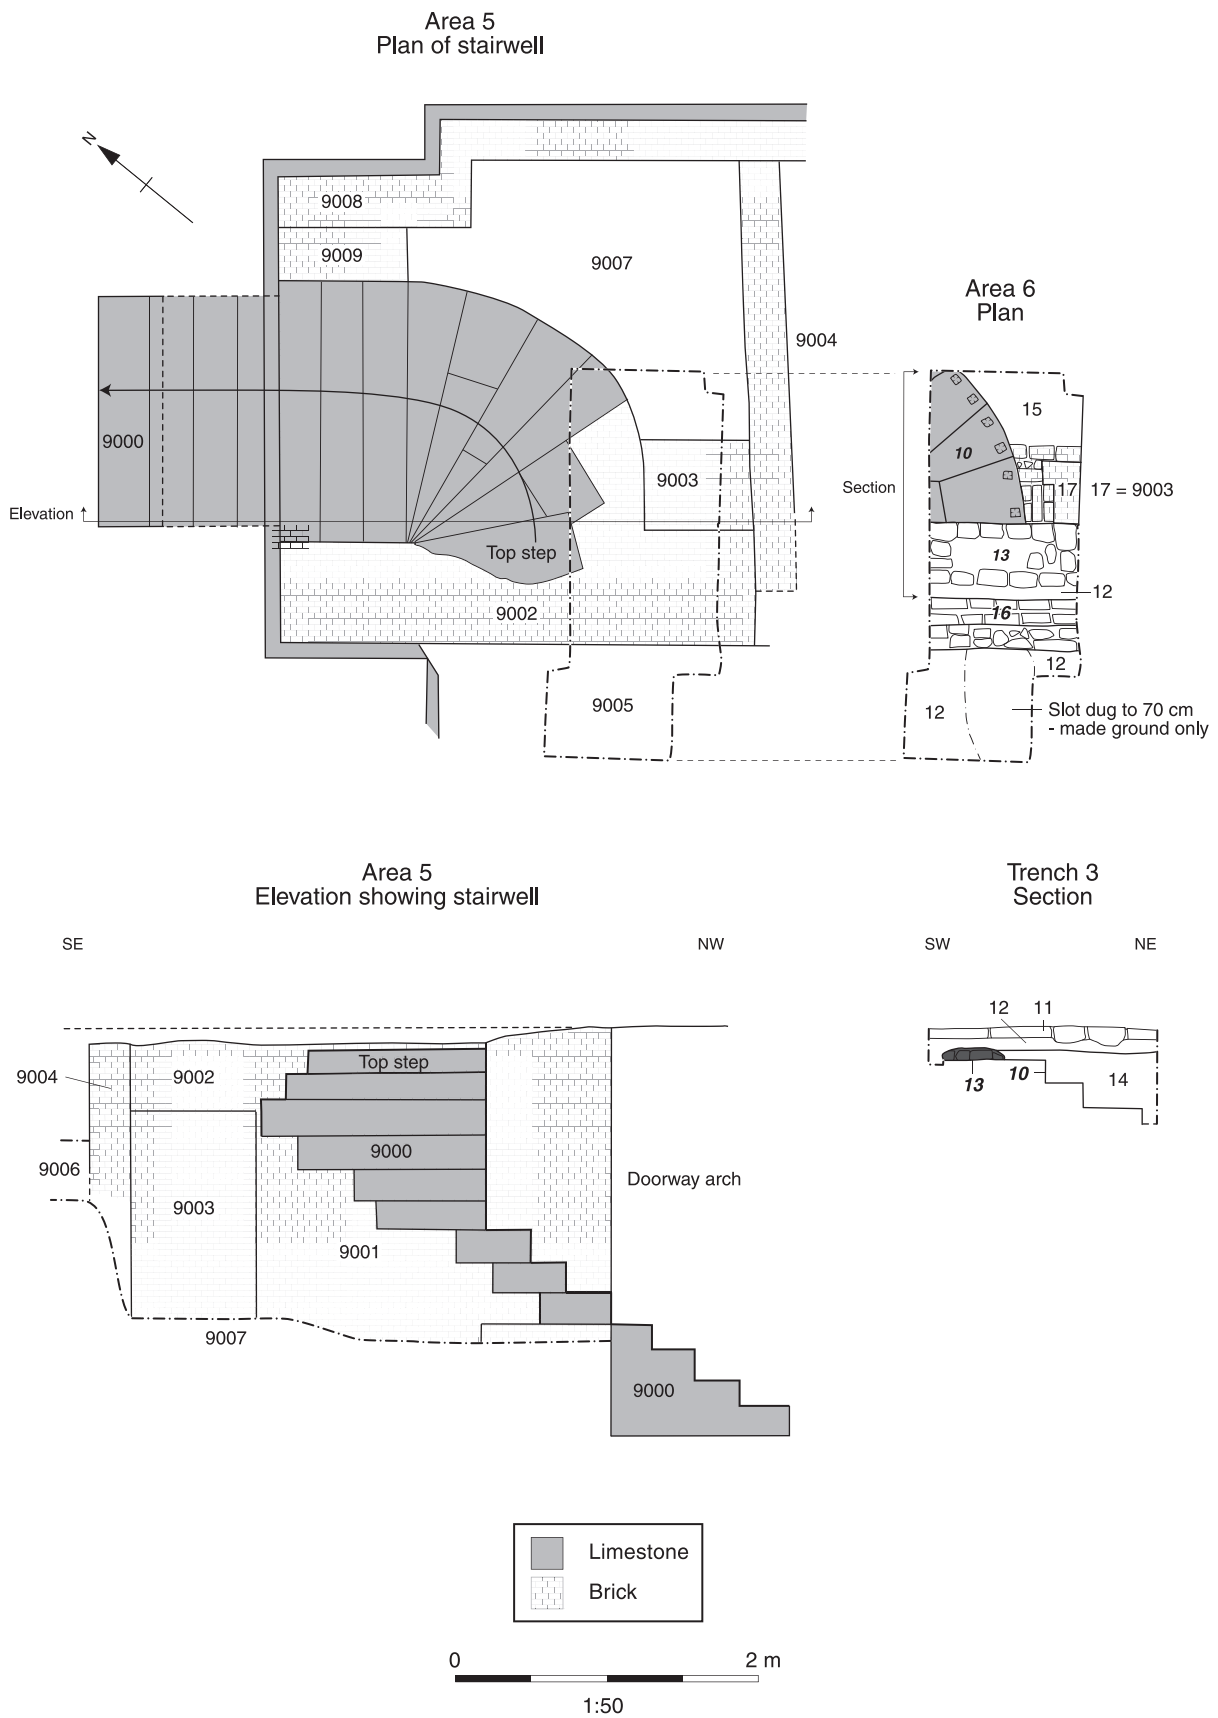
Area 5 and Test Pit 3: excavation of the stairwell 9000 S of the tower: Plans and sections
